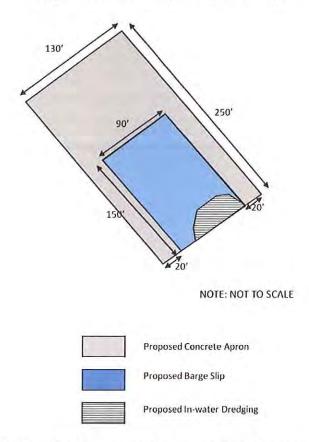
Turkey Point Units 6 & 7 Equipment Barge Unloading Area - Excavation and Regrading Areas
